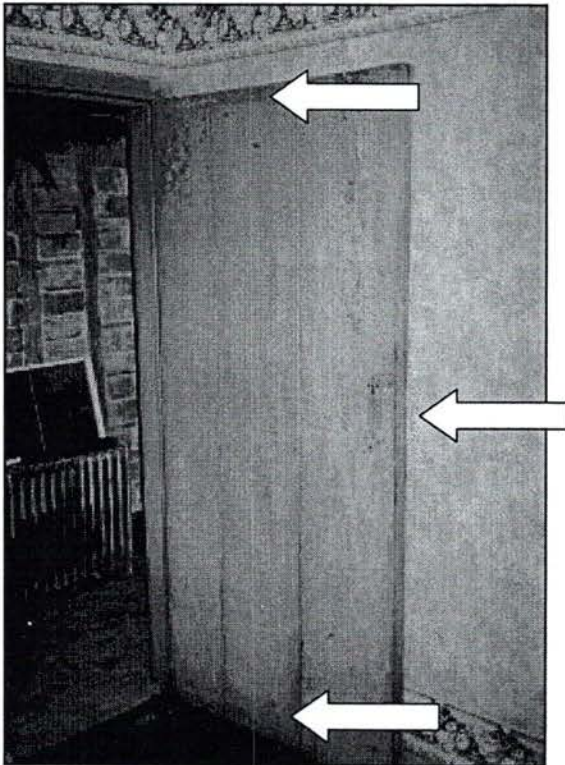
Recycled, hand planed, board and batton door to Room 208 (open). Ghosts of strap hinges and Suffolk latches are visible on this door.
